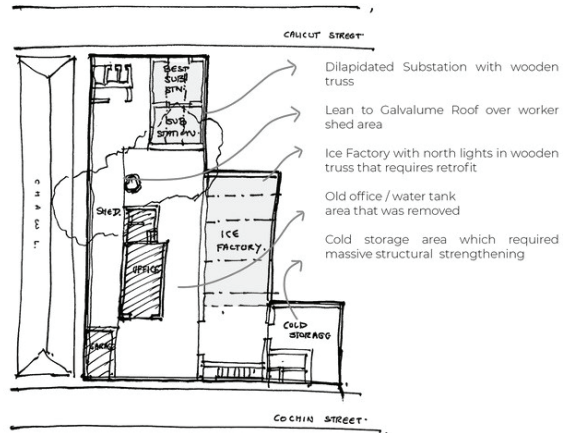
Restoration and renovation stages of IF:BE ice factory © Archdaily.com
